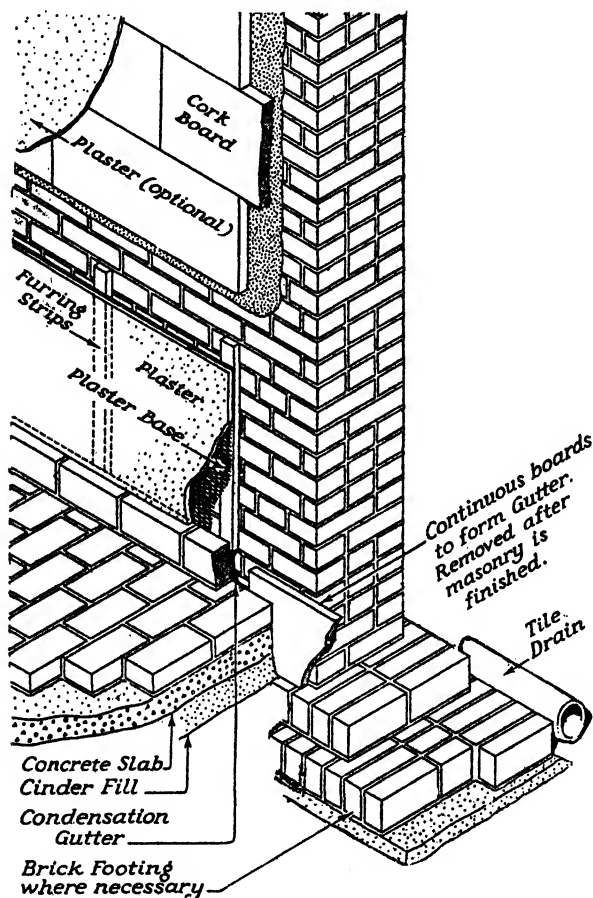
Alternate method of eliminating condensation on basement walls. Note formation of condensation gutter and use of insulating board and plaster. Open joints should be left at intervals in the brick base trim to allow water to reach condensation gutter.
